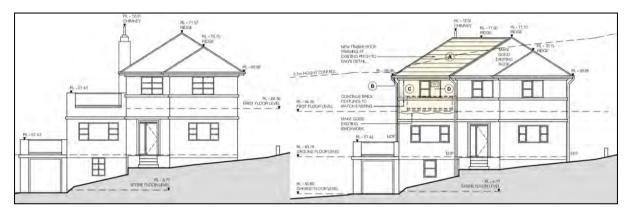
Existing West Elevation – EX203 A (left) and Proposed West Elevation – DA203 B (right)
